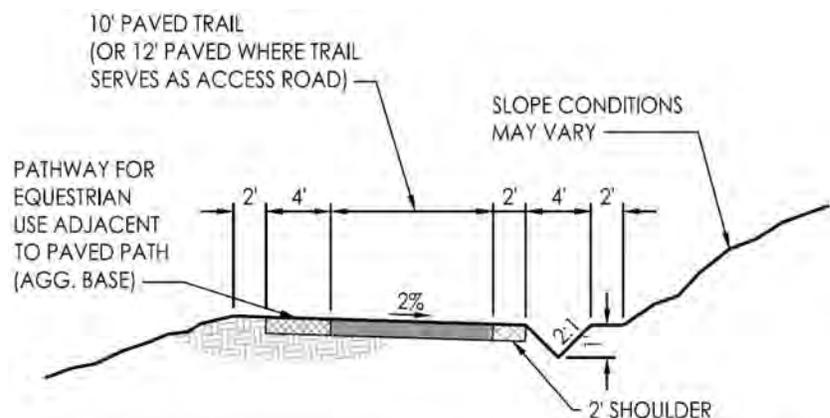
| Multi-Purpose Trail Design at Access Road
